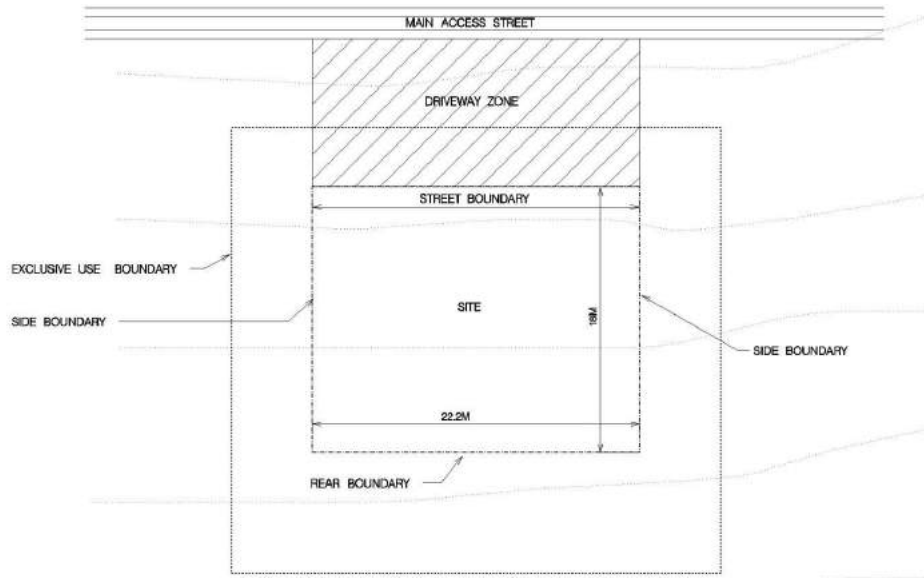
Typical Fynbos & Paddock Site – Driveway Access zone
